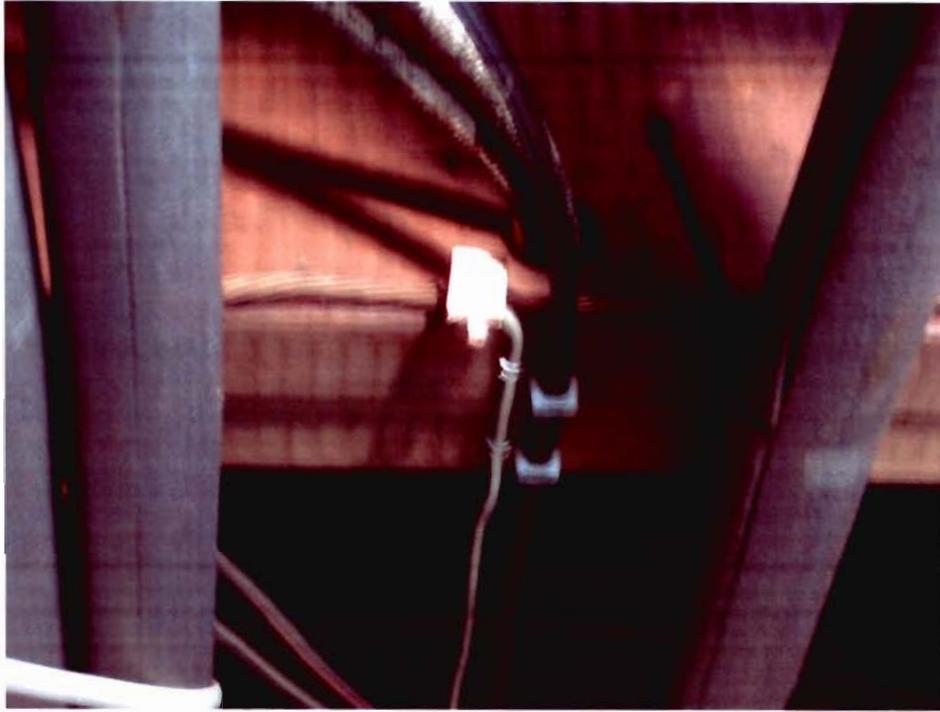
[REDACTED] Ponderosa Dr., FiOS grounded to power ground.
